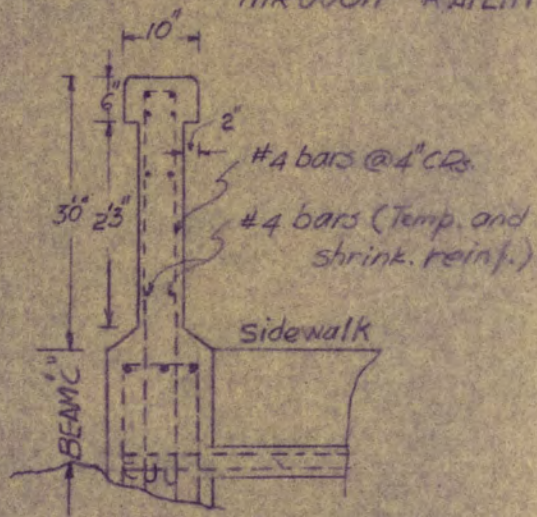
LONGITUDINAL SECTION THROUGH RAILING.
